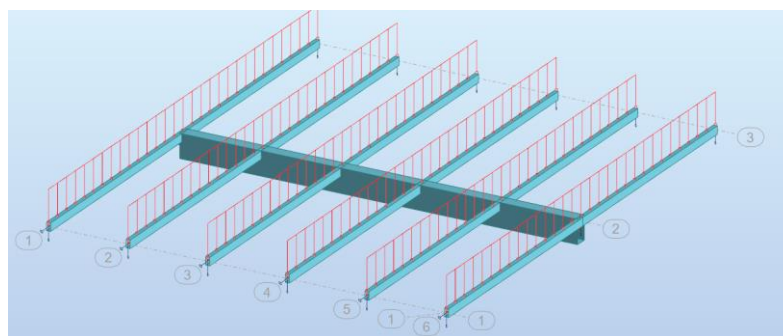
Static diagram and loads of the rib-and-slab floor grid (source: own study)
